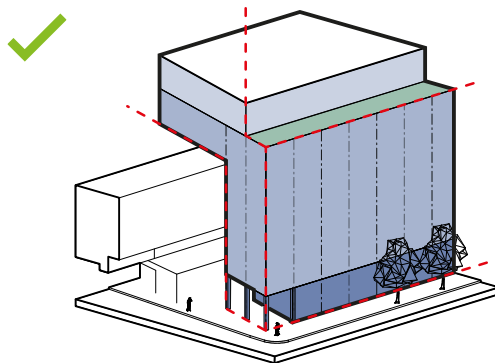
Acceptable: Northeast corner achieving public space through the maximum parameter (colonnade)
